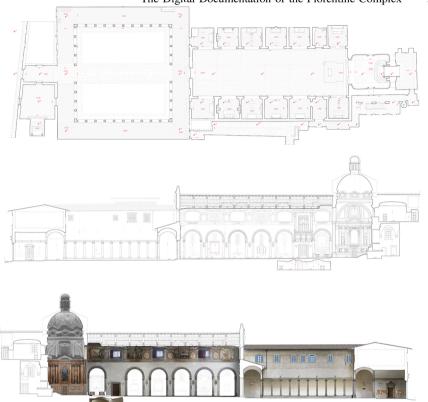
Final 2D drawings: (Top) general plan of the complex, (Middle) wireframe restitution of a longitudinal section and (Bottom) opposite section with photoplan.
